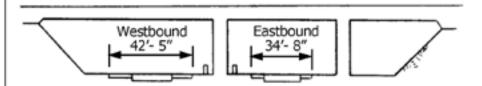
Bridge elevation view of two separate highway features below the bridge.
